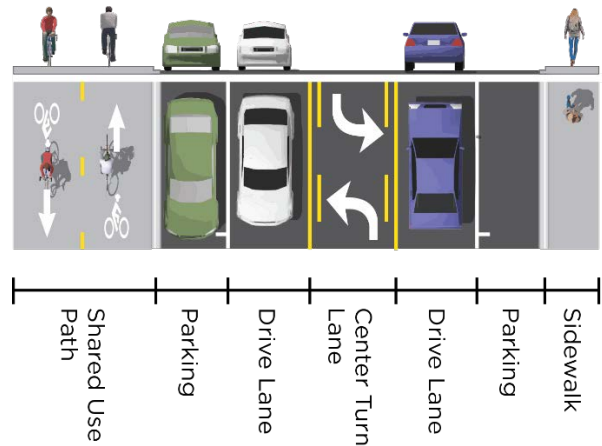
Potential Road 20 Cross Section - San Pablo Ave to El Portal Dr
